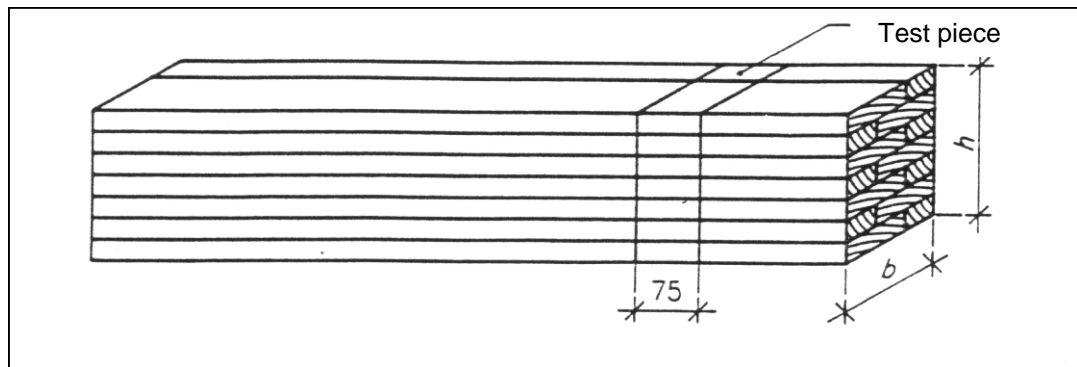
Method to take a test piece – Delamination test EN 391.
